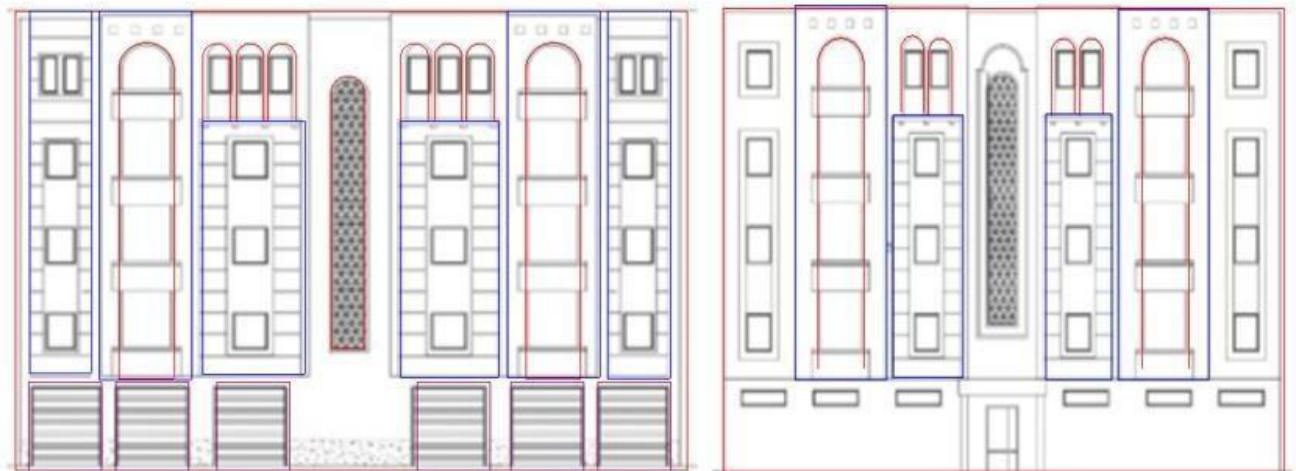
Facades of bar block (Source: design office Nebar Omar +Author treatment , 2025).
